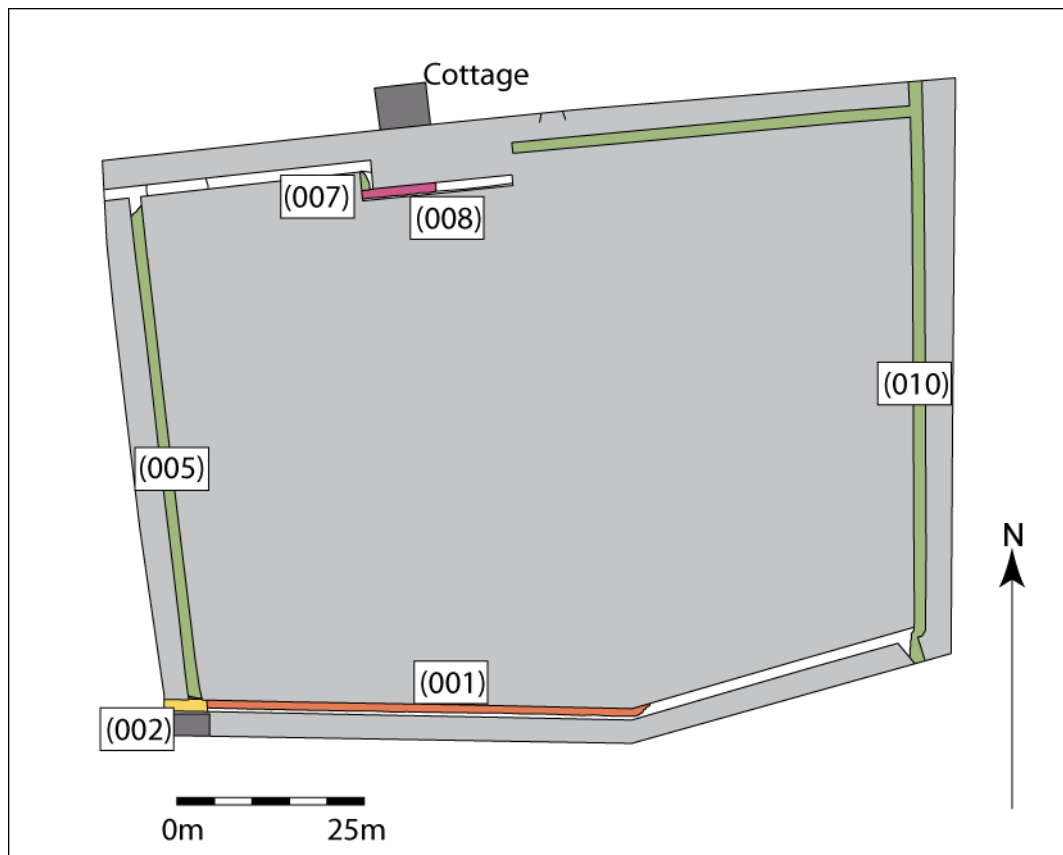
Plan showing location of ground-works and features within the Walled Garden
